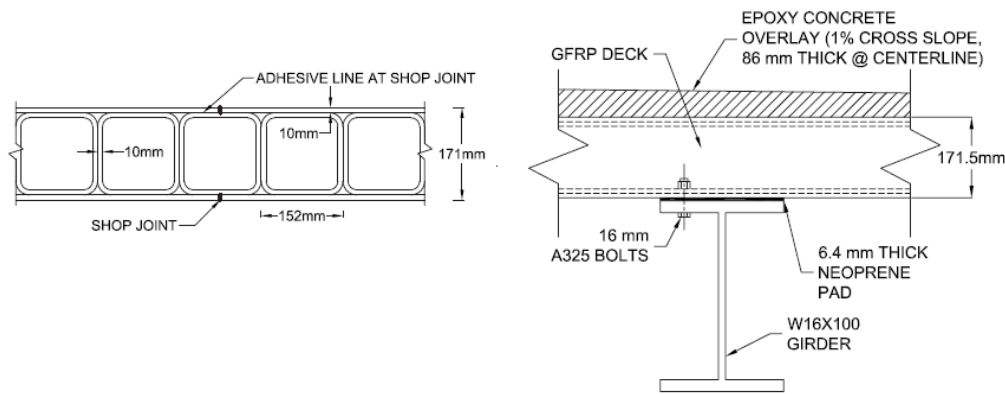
Deck type and deck to girder connection of Snohomish county bridge (Berman & Brown, 2010)
